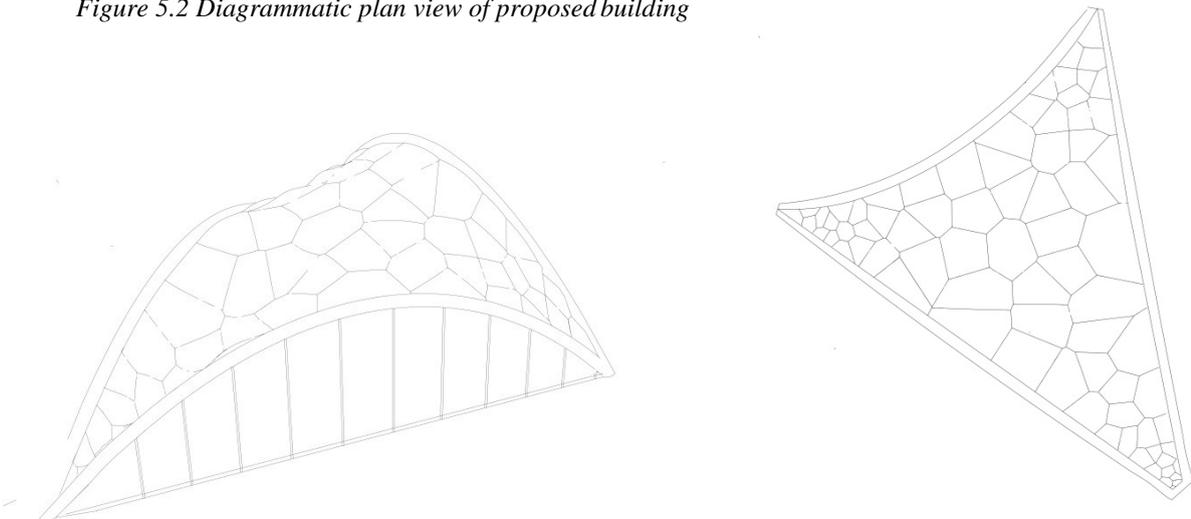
Axonometric and roof plan of proposed building; horizontal collector area 35 m<sup>2</sup>, building volume 52 m<sup>3</sup>.
